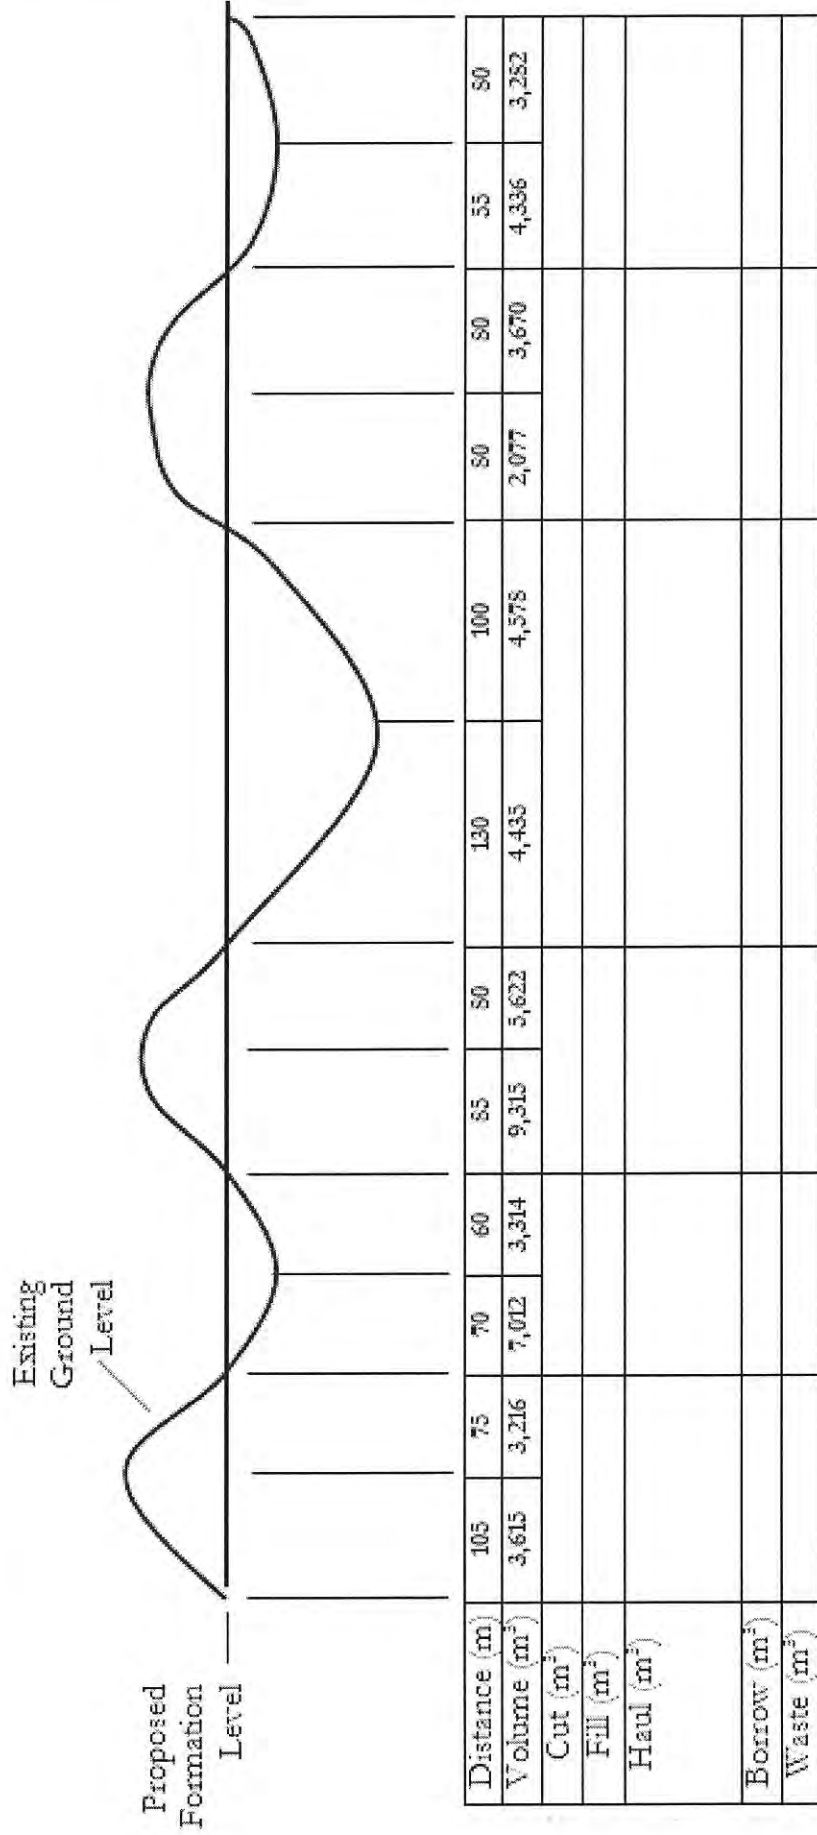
(a): Longitudinal profile of a site for a proposed highway
